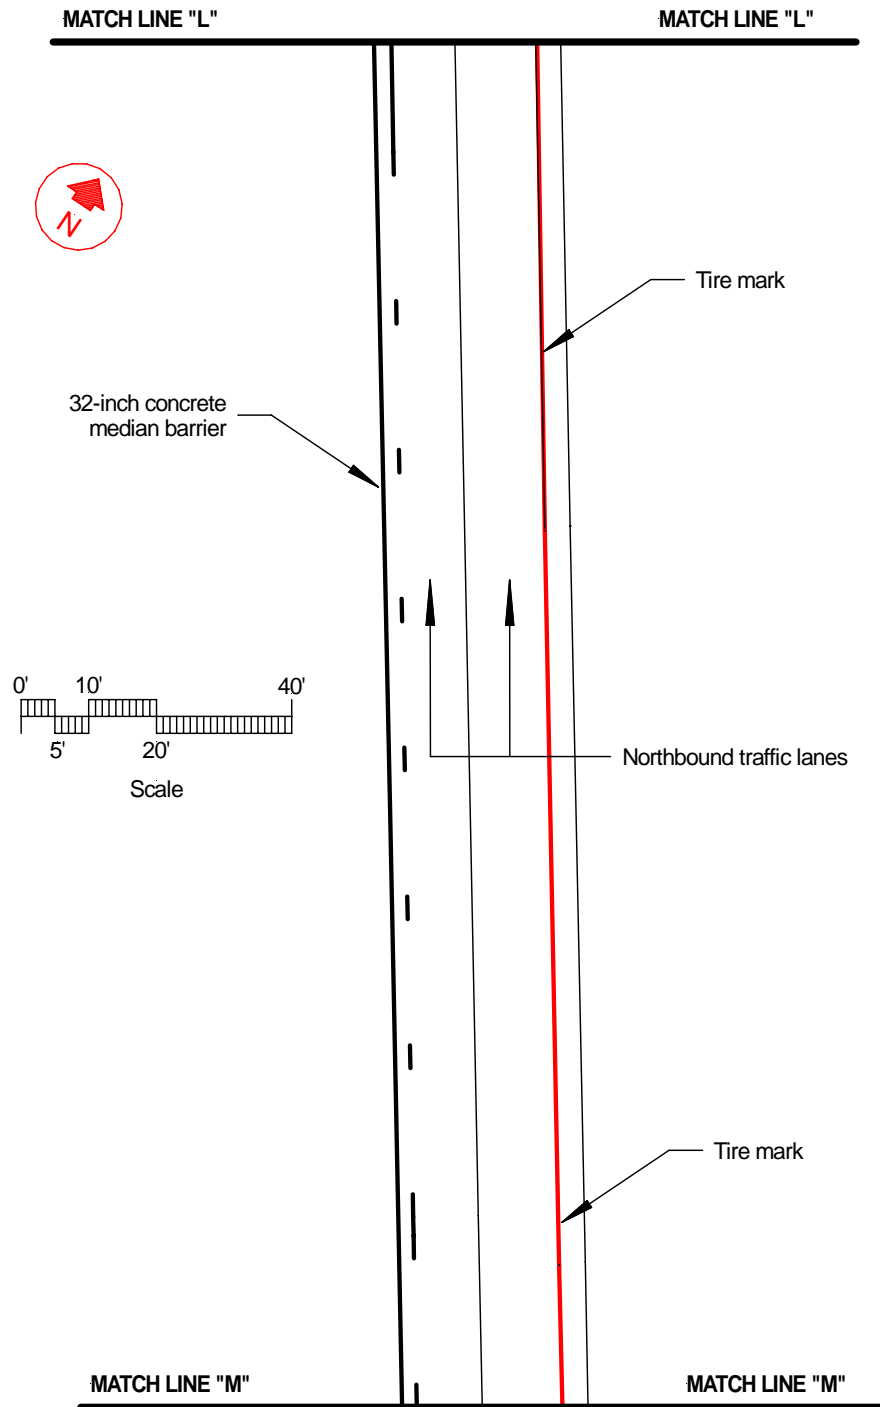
NTSB map of L-M pavement markings and roadway evidence.
